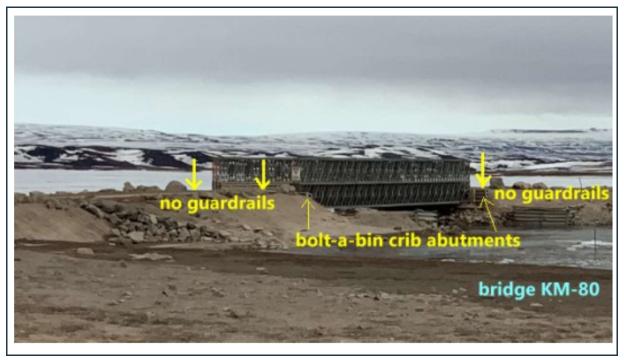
View of the approach embankments with bolt-a-bin cribs at bridge 80. No guardrails adjacent to the cribs at this bridge.
